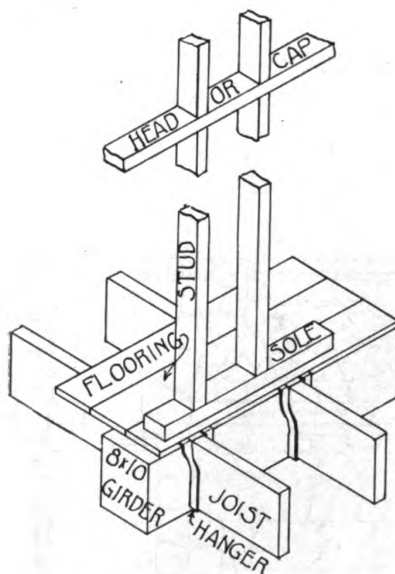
A good way to construct a first floor partition. There is much less wood laid horizontally, so settling is less. The amount of wood laid horizontally in exterior and interior walls should be as nearly the same as possible, as settlement will then be uniform.
